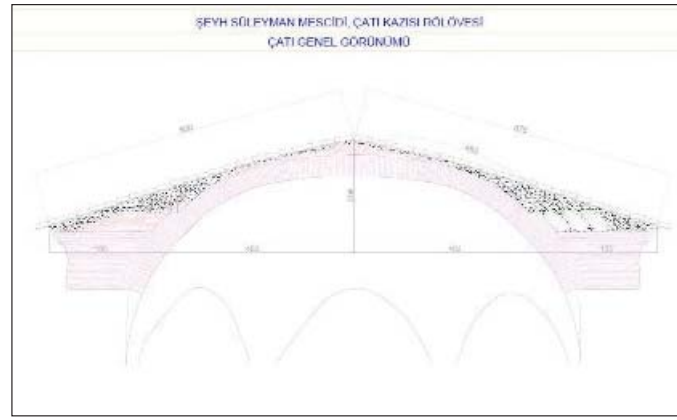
Amphoras on the section of Masjid's roof (Drawing: Mustafa Can Yalçın)
